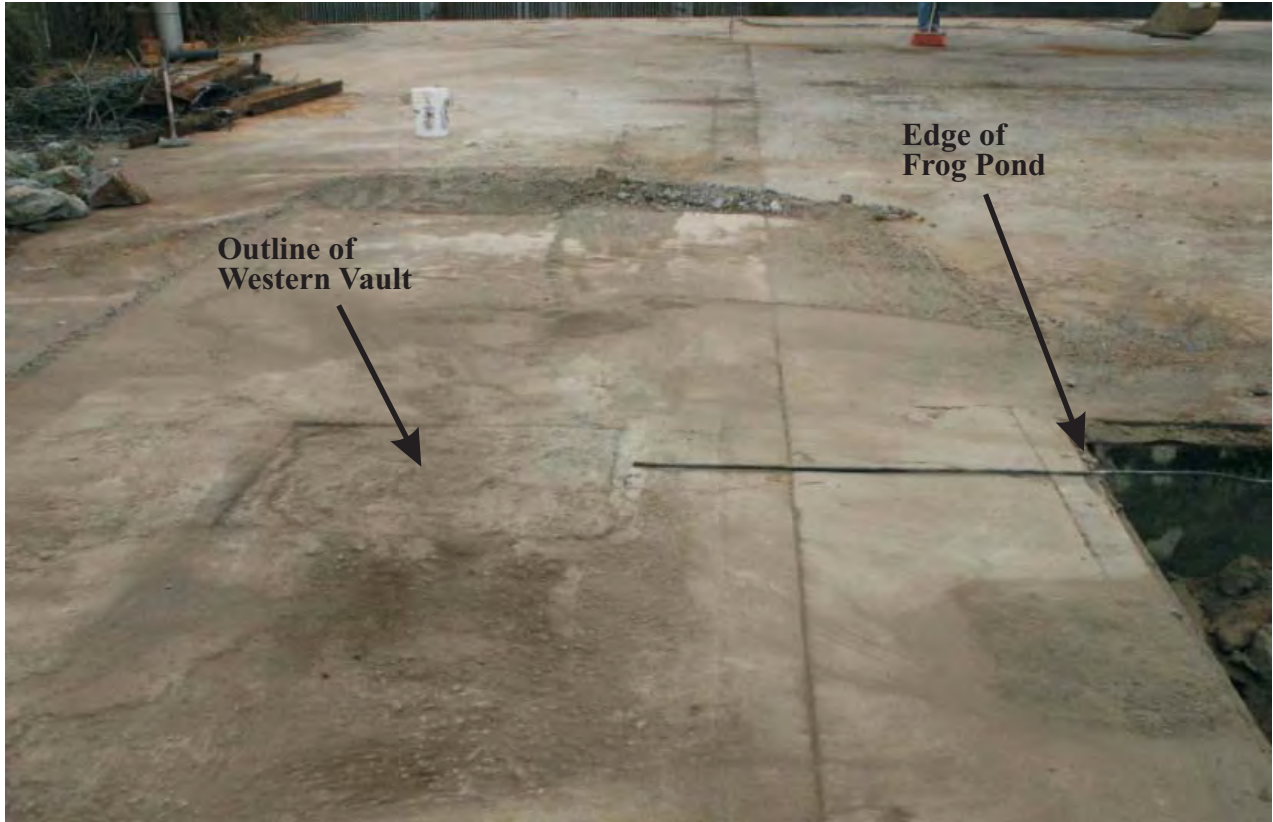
Outline of Western Vault (rebar on surface indicates alignment of metal pipe penetrating western sidewall of Frog Pond connected to sump).
